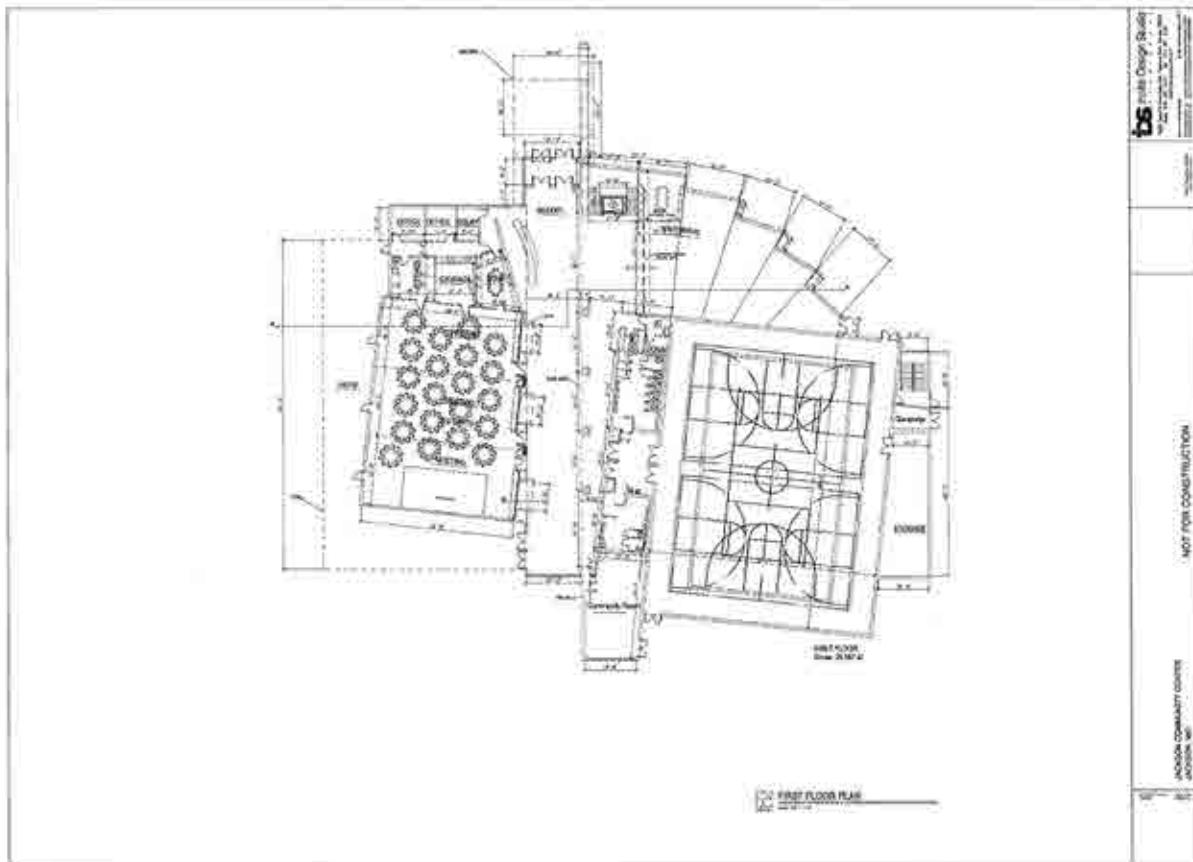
Floor plan of the first floor of Jackson's Community Center.
